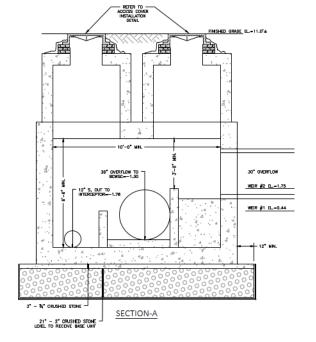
Typical Box Culvert and Access/Diversion Structure Details
